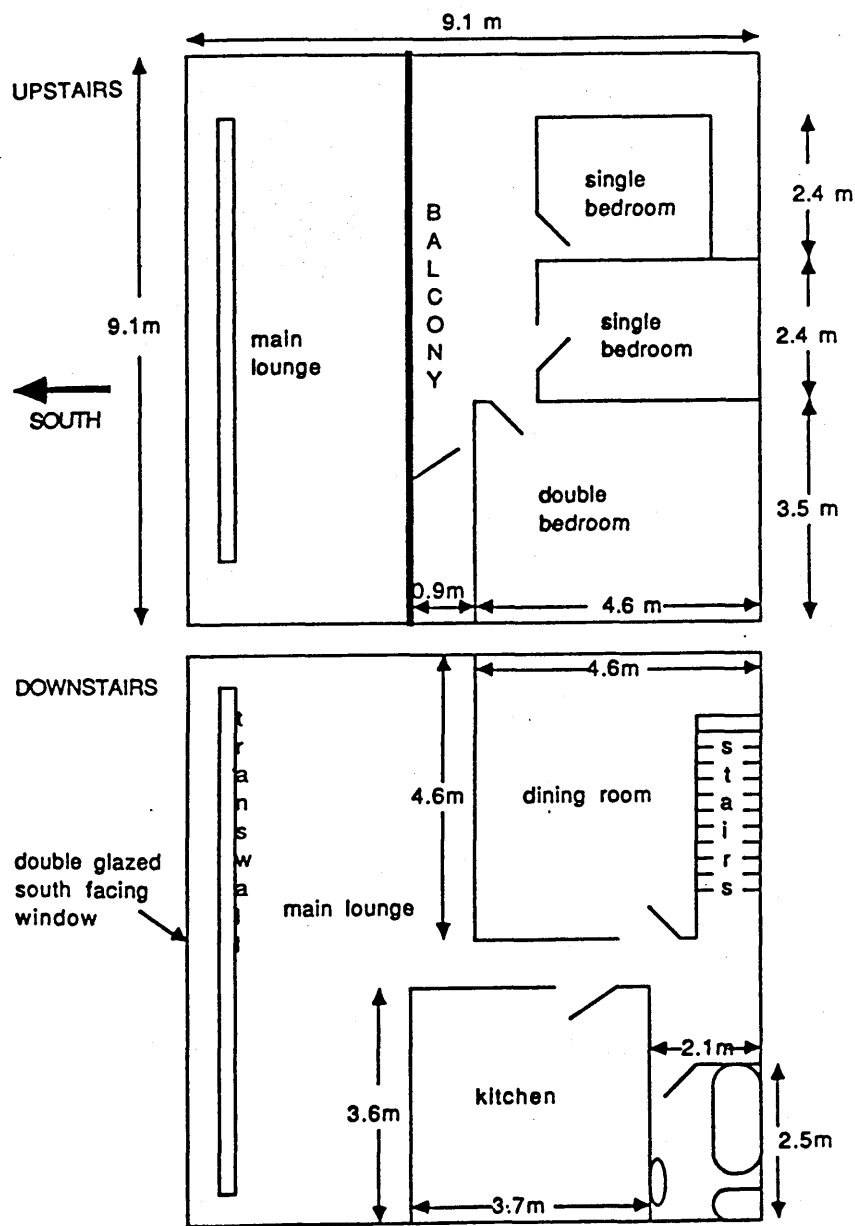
(e) The Plan of House Design,[Ham,1988].
